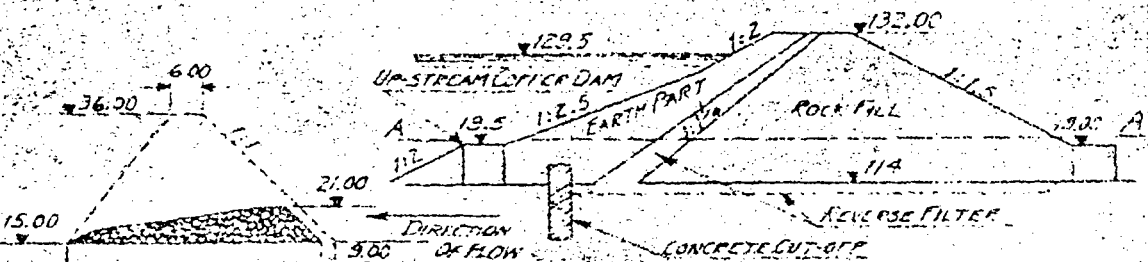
DAM NO. 1 ON THE RIVER NILA (ELEVATIONS IN METRES)
